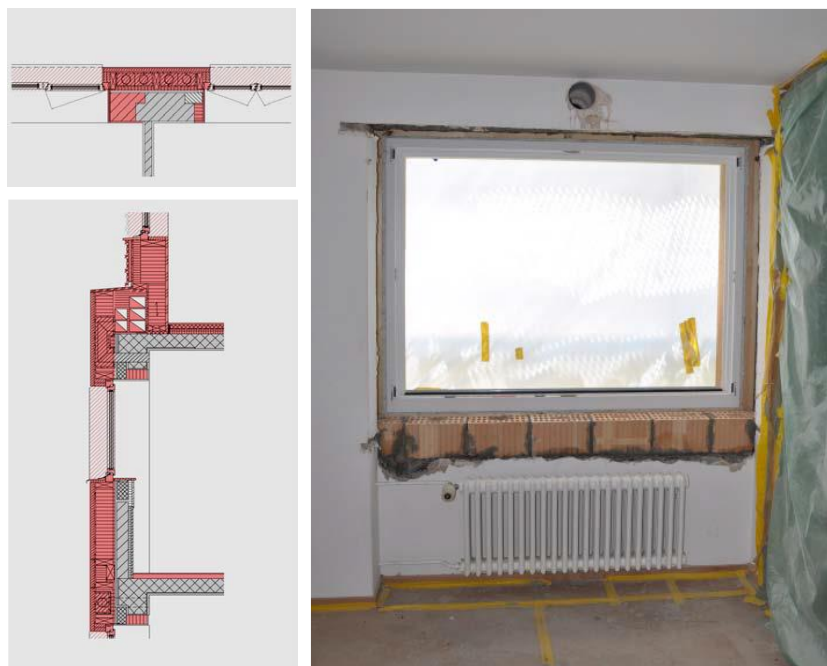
Horizontal section of the facade with integrated ventilation ducts (Top left), vertical section of the facade with horizontal ventilation distribution (Bottom left), and an interior photo showing the air inlet above the window (Right). Highlighted in red are the renovation elements.
